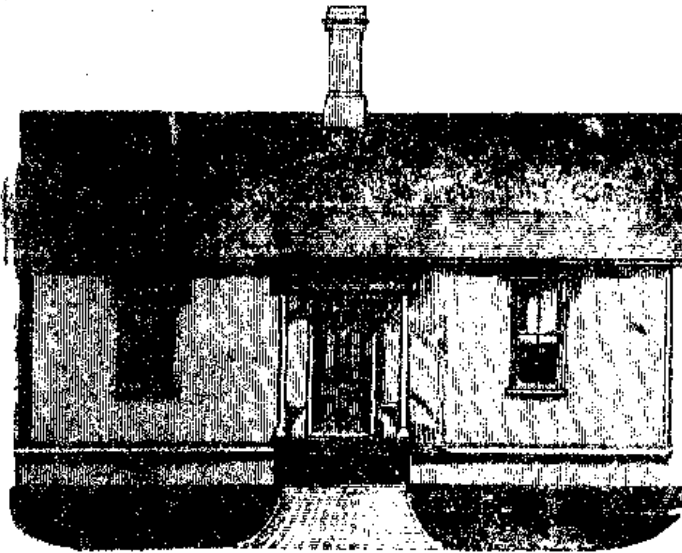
ELEVATION OF ONE-STORY HOUSE.
